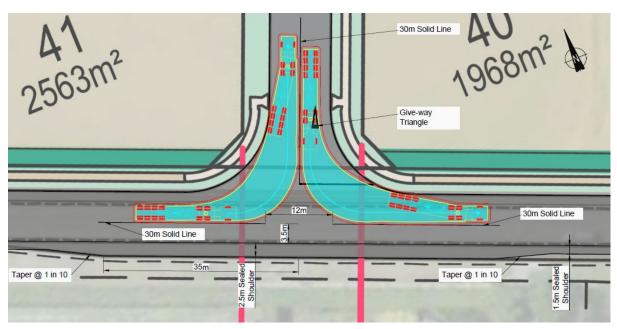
Proposed Ryans Road / Site Access Road Intersection (Typical)
